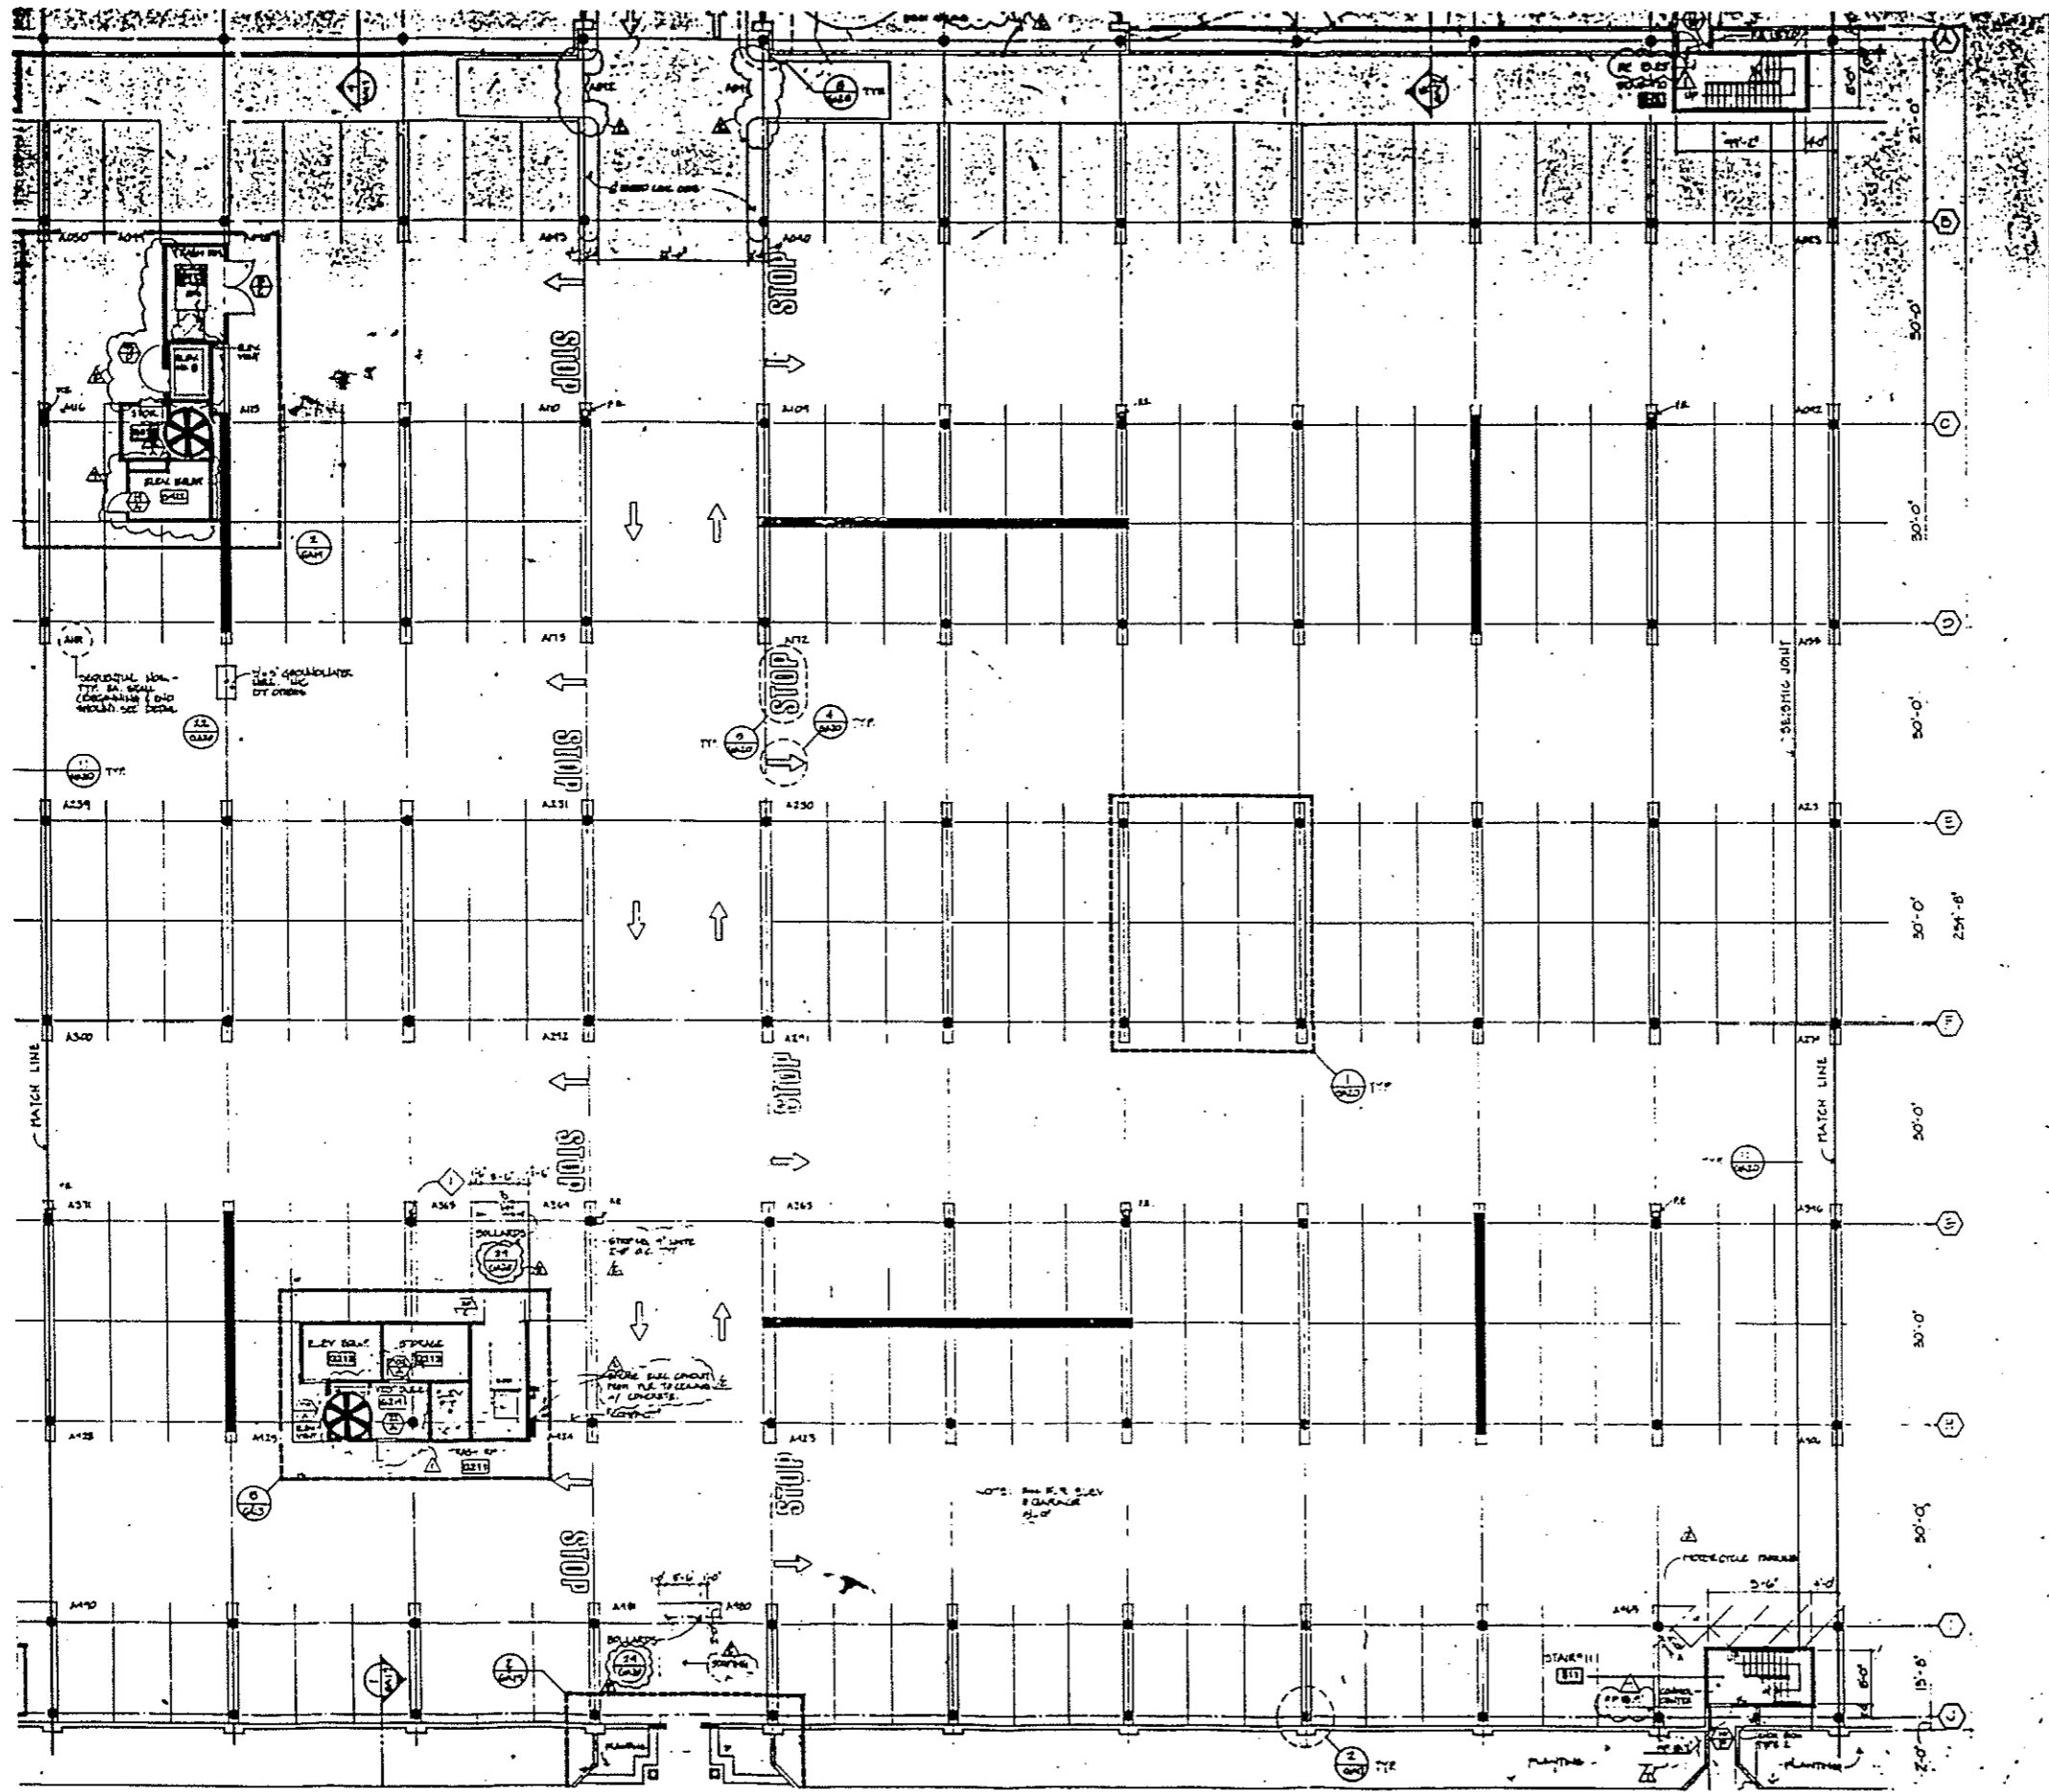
SCHEMATIC DRAWING OF SHAFT VENTILATION AND GAS DETECTION AT BAY CENTER OFFICES, EMERYVILLE
